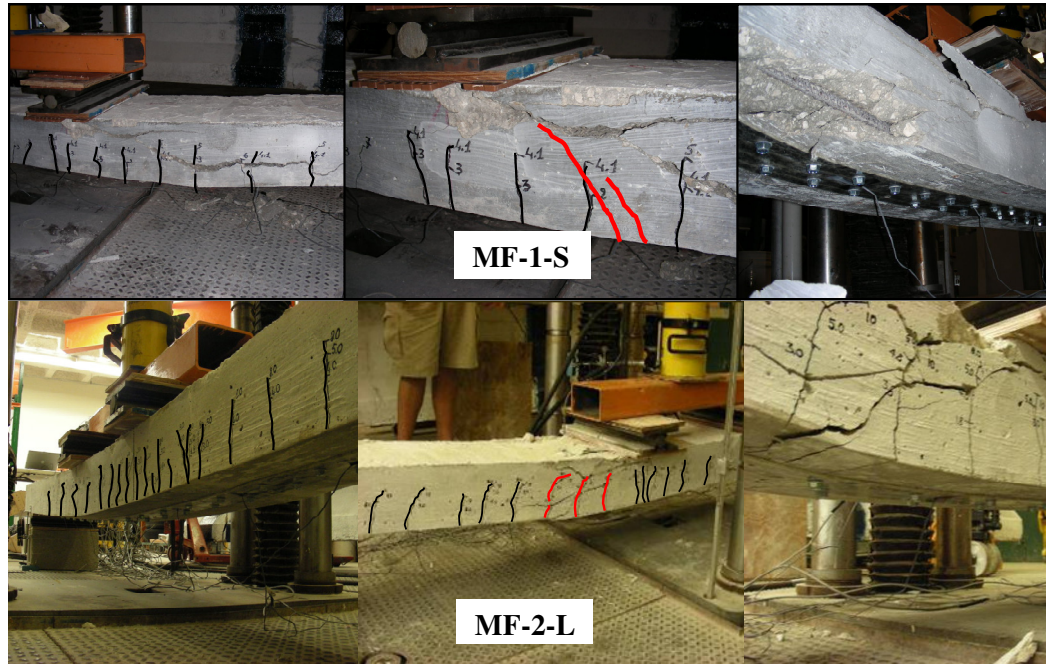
Crack pattern and failure modes in the slabs MF-1-S and MF-2-L
